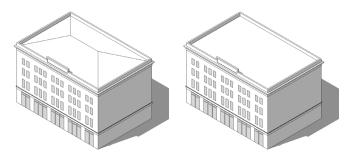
G.2.a.ii: Hipped roof with parapet (left); flat roof with parapet (right)
